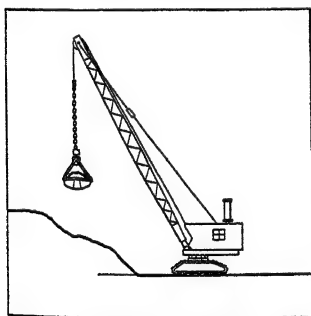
MOVING STEAM CRANE FOR USE IN CLEARING DUMPS
